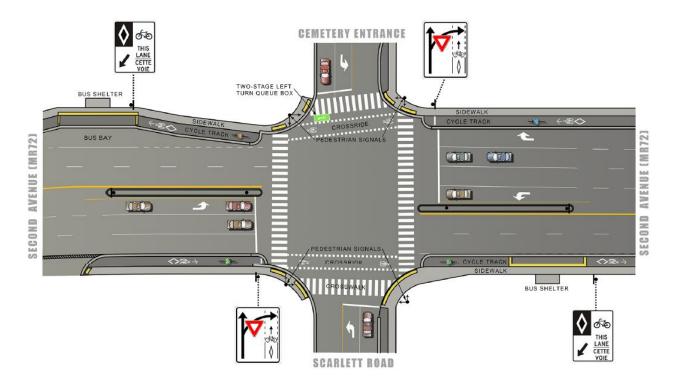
Illustration of new cycling infrastructure at Second Avenue and Scarlett Road Intersection
